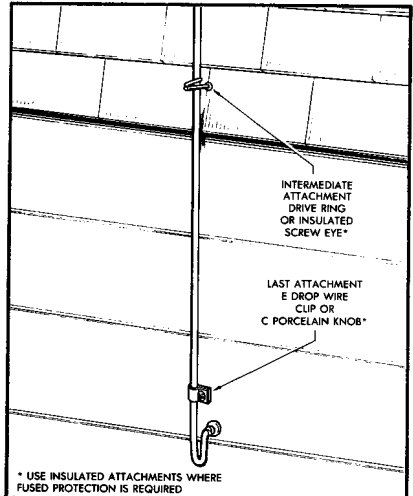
Drop Wire Crossing Wood or Stucco on Wood Building Projection
